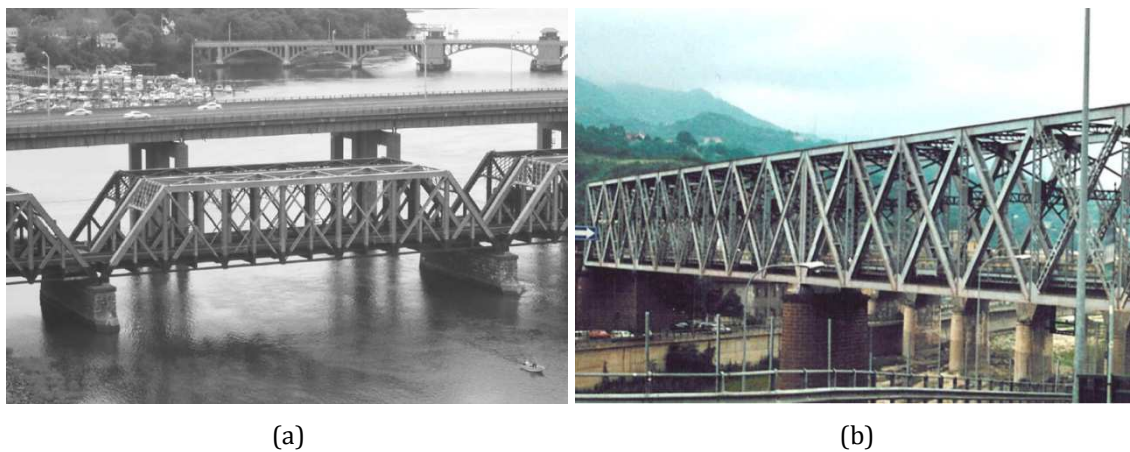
Tested bridges (II): (a) Railroad truss bridge in Connecticut, USA (DelGrego *et al.*, 2008); (b) Campasso Bridge, Italy (Brencich and Gambarotta, 2009).
